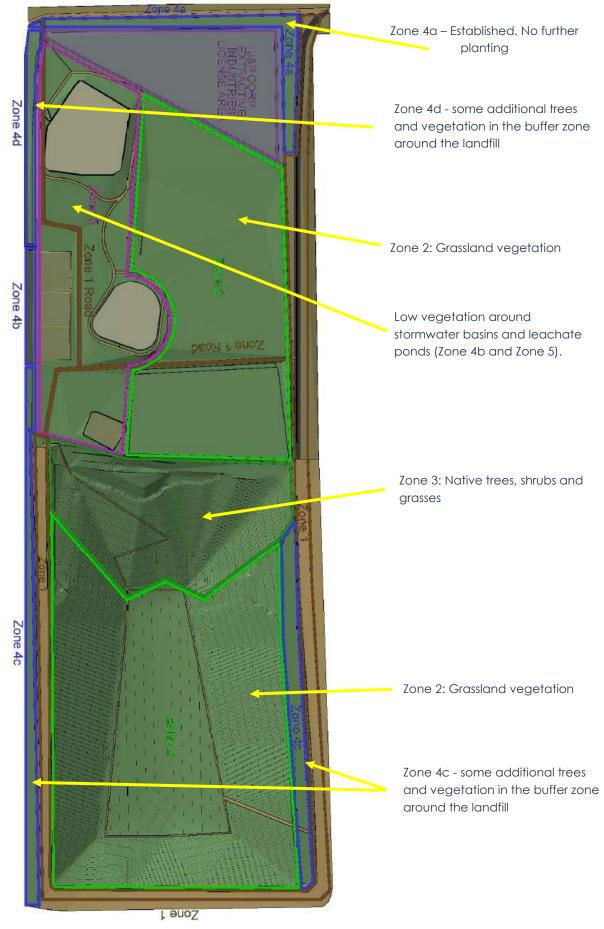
Landscape zones and proposed planting (Figure 14 from Masterplan)
